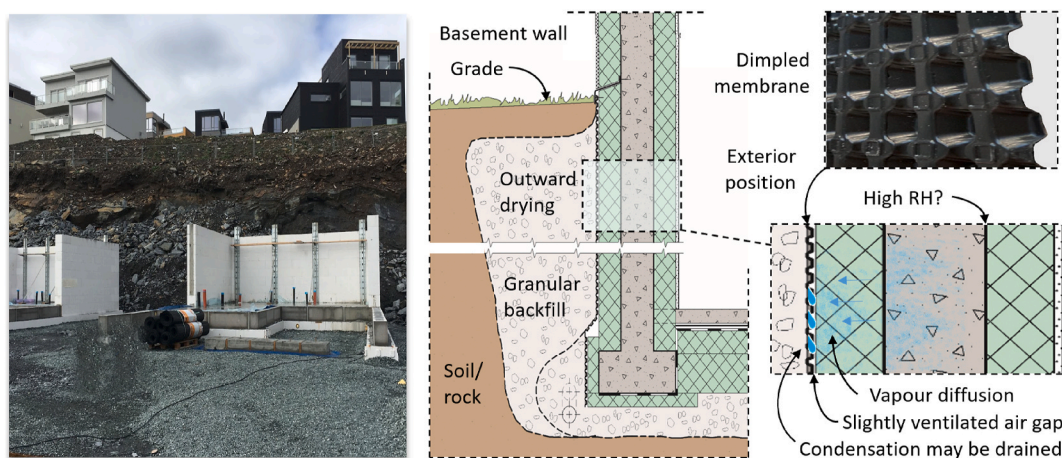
Basement in dwelling during construction (left). Illustration of basement wall, a dimpled membrane, and a slightly ventilated air gap.
